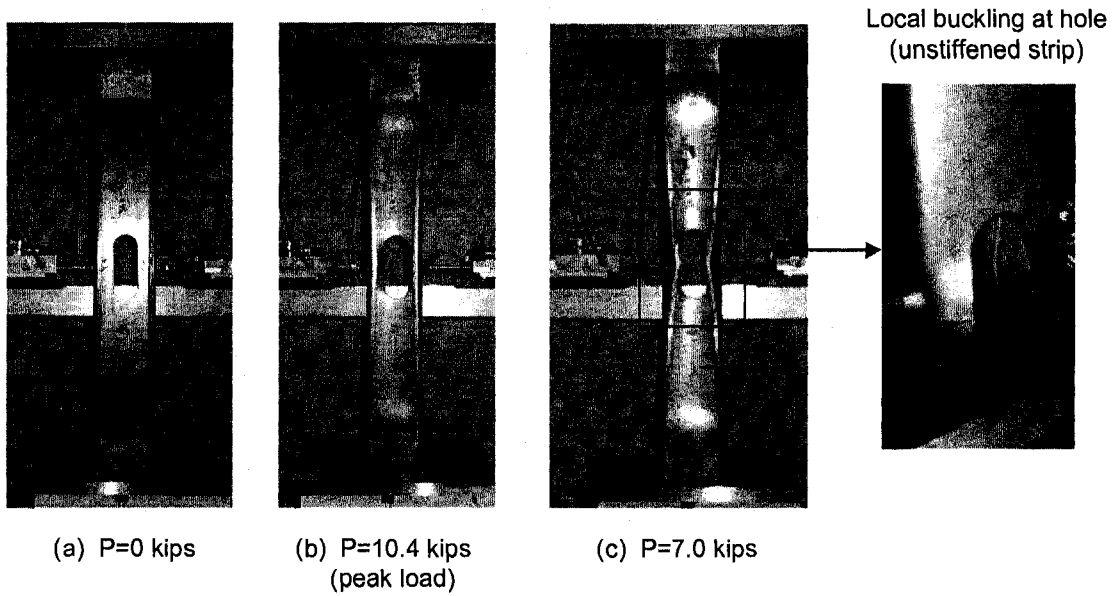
Load-displacement progression for short column specimen 362-2-24-H
